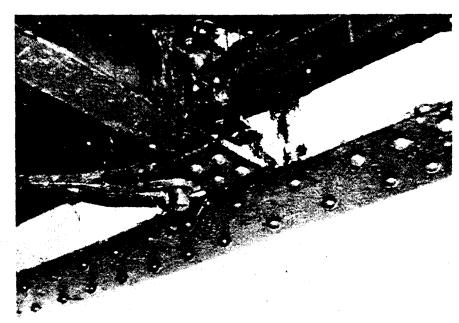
Lateral Bracing Connection on a Through Girder Bridge
